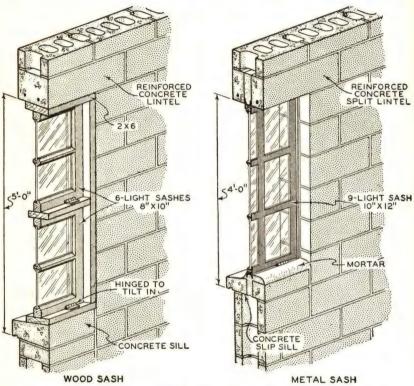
Use of Reinforced Concrete Lintels in Concrete Block Walls for Wood and Metal Sash Windows
